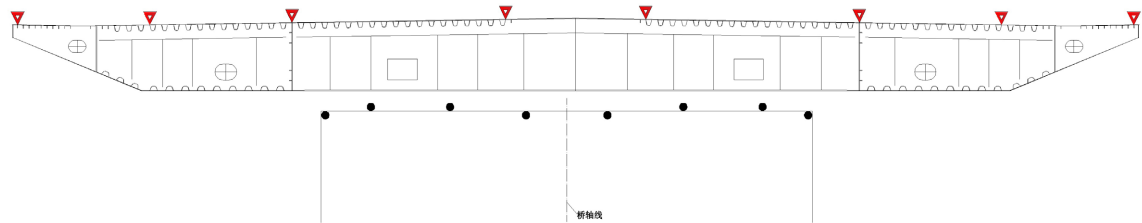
Schematic diagram of the layout of the elevation measurement point in the installation and positioning stage of the steel box girder
